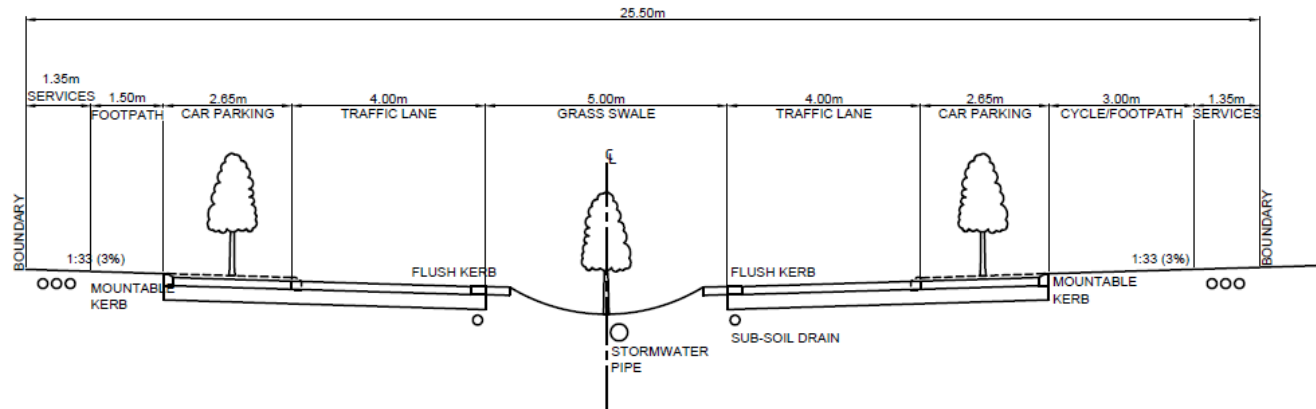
Lorenzen Bay Structure Plan - road cross sections
